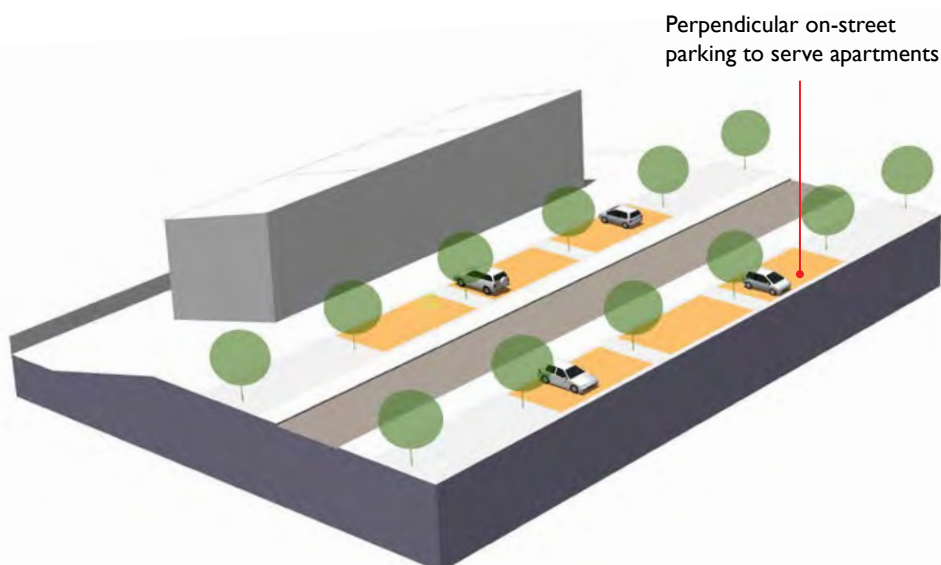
APARTMENT PARALLEL TO SLOPE
